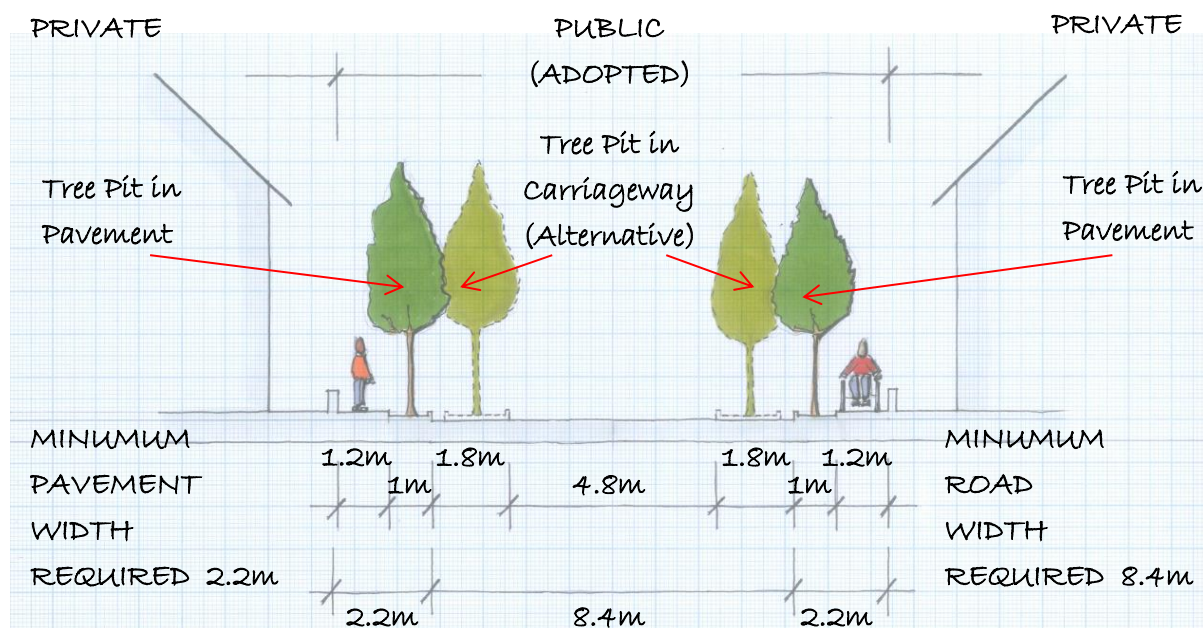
Suggested minimum width requirement for pavement and carriageway in order for them to be able to accommodate a BCC Adopted Standard Street Tree Pit.
